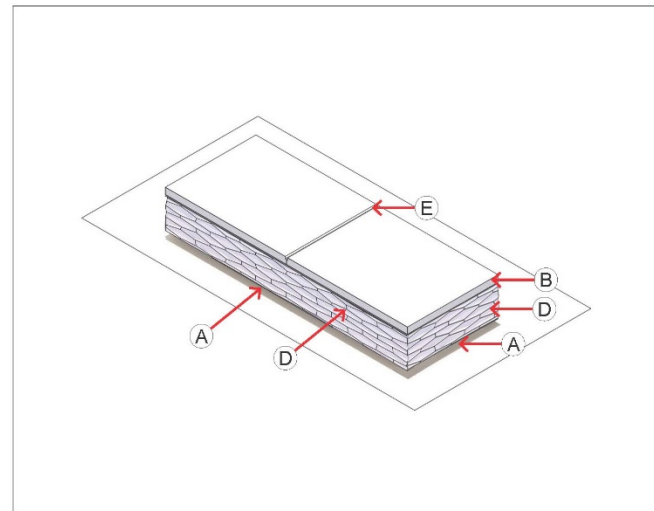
Seat wall type 1 axonometric view - flat end
